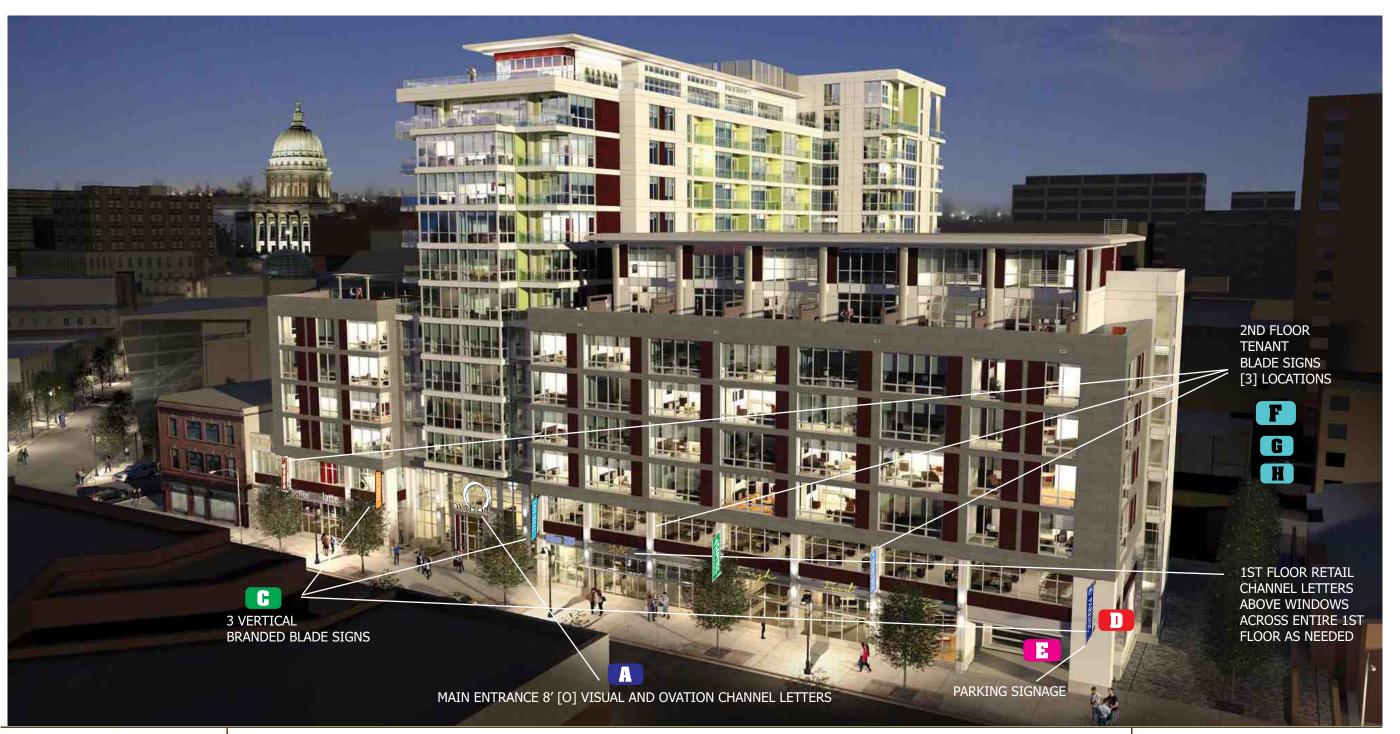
EXTERIOR BUILDING SIGNAGE
